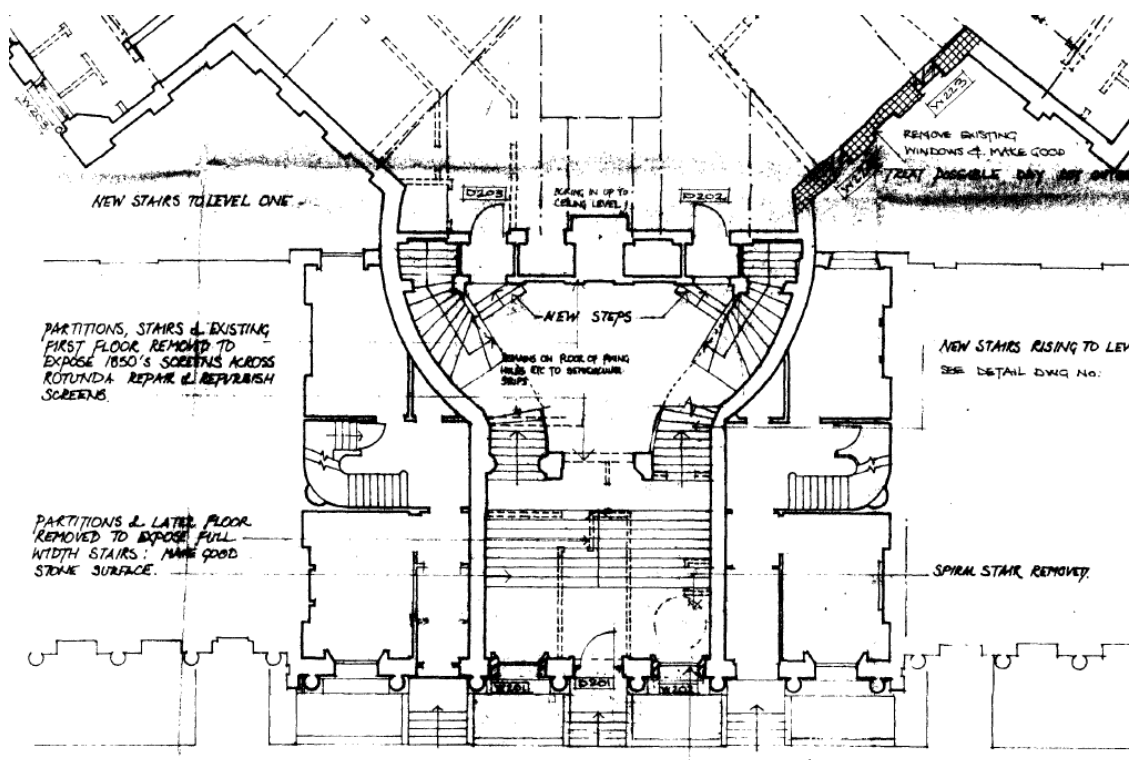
Proposed ground floor of nos. 17-19, 1994. Camden planning ref: HB/9370268.
